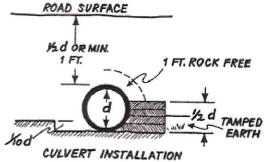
The elements of a properly installed ditch relief culvert. The culvert is angled at about 30 degrees to the road alignment to help capture flow and prevent culvert plugging or erosion of the inlet area. It is set at the base of the fill (ideally) or with a grade slightly steeper than the grade of the contributing ditch (but never with a grade less than 2 percent) (USDA-SCS, 1983). At a minimum, the grade of the ditch relief culvert should be sufficient to prevent sediment accumulation at the inlet or deposition within the culvert itself (it should be self-cleaning) (USDA-SCS, 1983).
